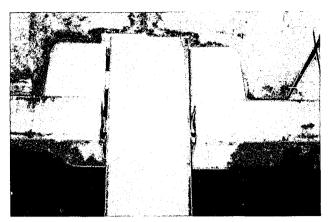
"L"-girders bearing on concealed column haunches. A recessed block-out in the girder soffit is filled with a well bonded, non-shrink mortar.
